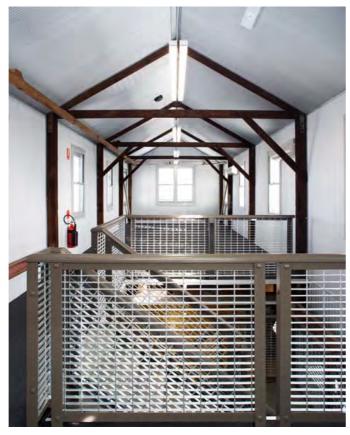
Original timber structure is a counterpoint to the contemporary materials and detailing.
